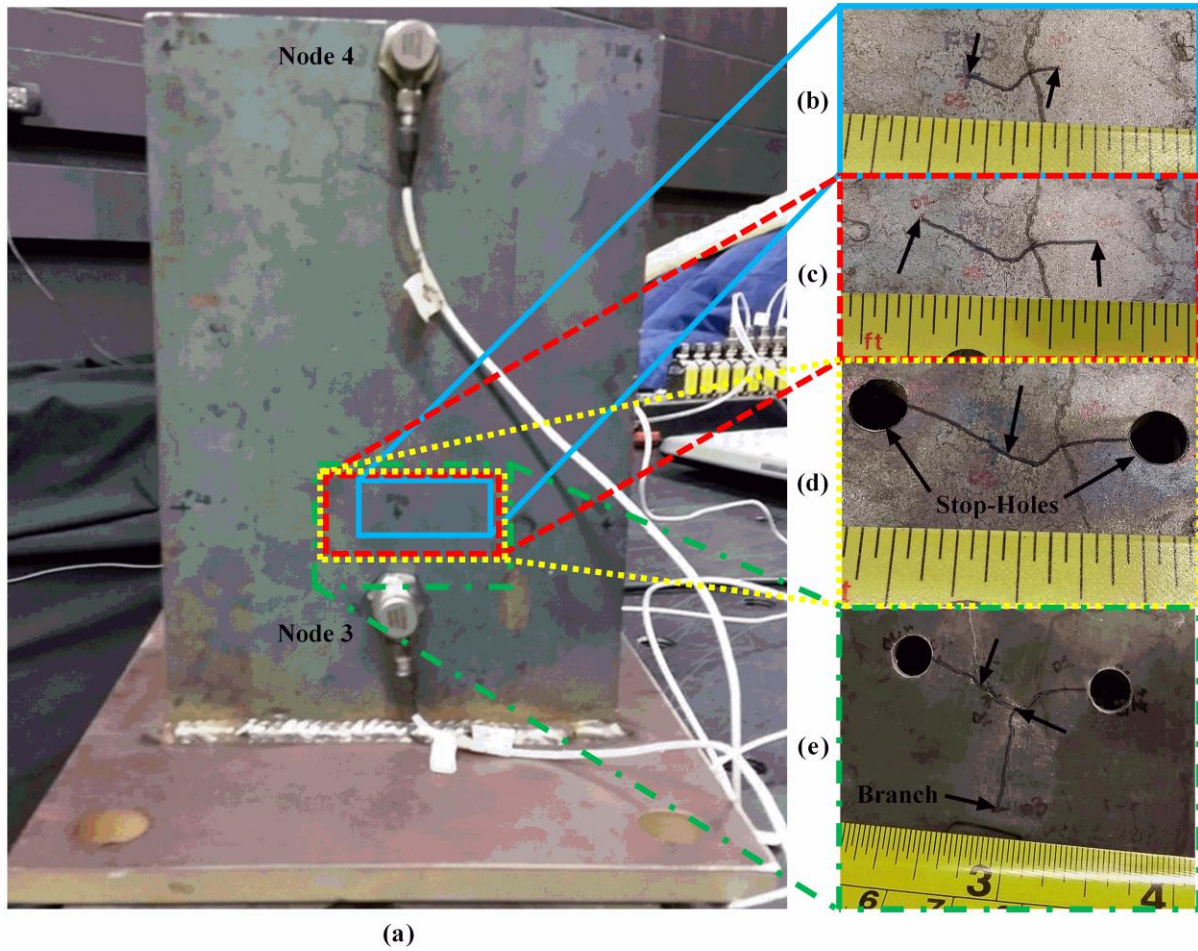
Damage caused in Specimen 2 - Side B: (a) overall side view indicating locations of damage, (b) 13 mm crack (D1), (c) 25 mm crack (D2), (d) 25 mm crack with 6.35 mm diameter holes drilled at crack tips (D2H), (e) 25 mm crack with 6.35 mm diameter holes drilled at crack tips and an approximately 13 mm crack branching from the middle of the 25 mm crack (D3H)
